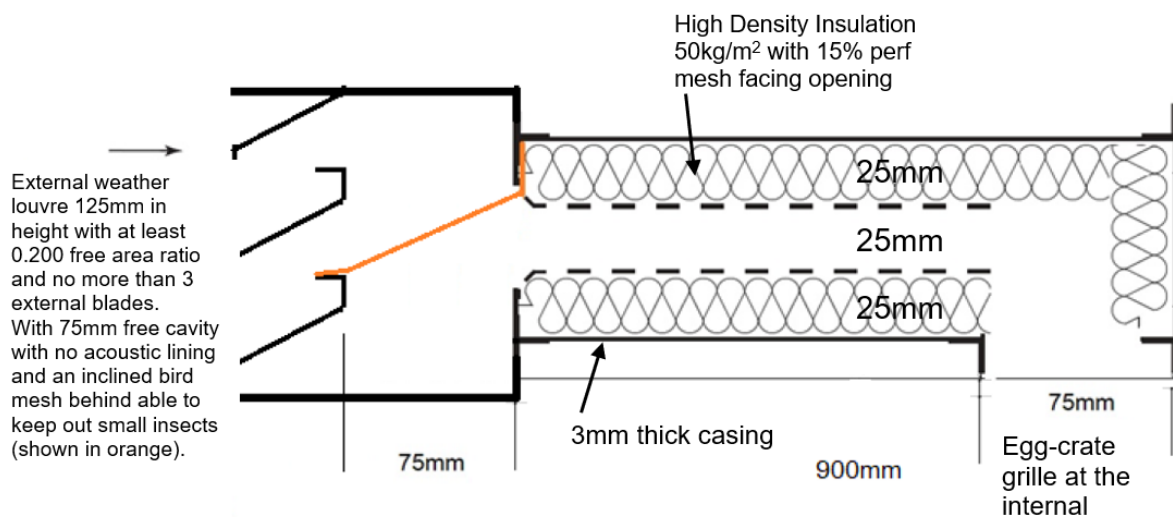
Typical façade section showing the location of the ventilation plenums and silencing treatments to mitigate noise impacts.
